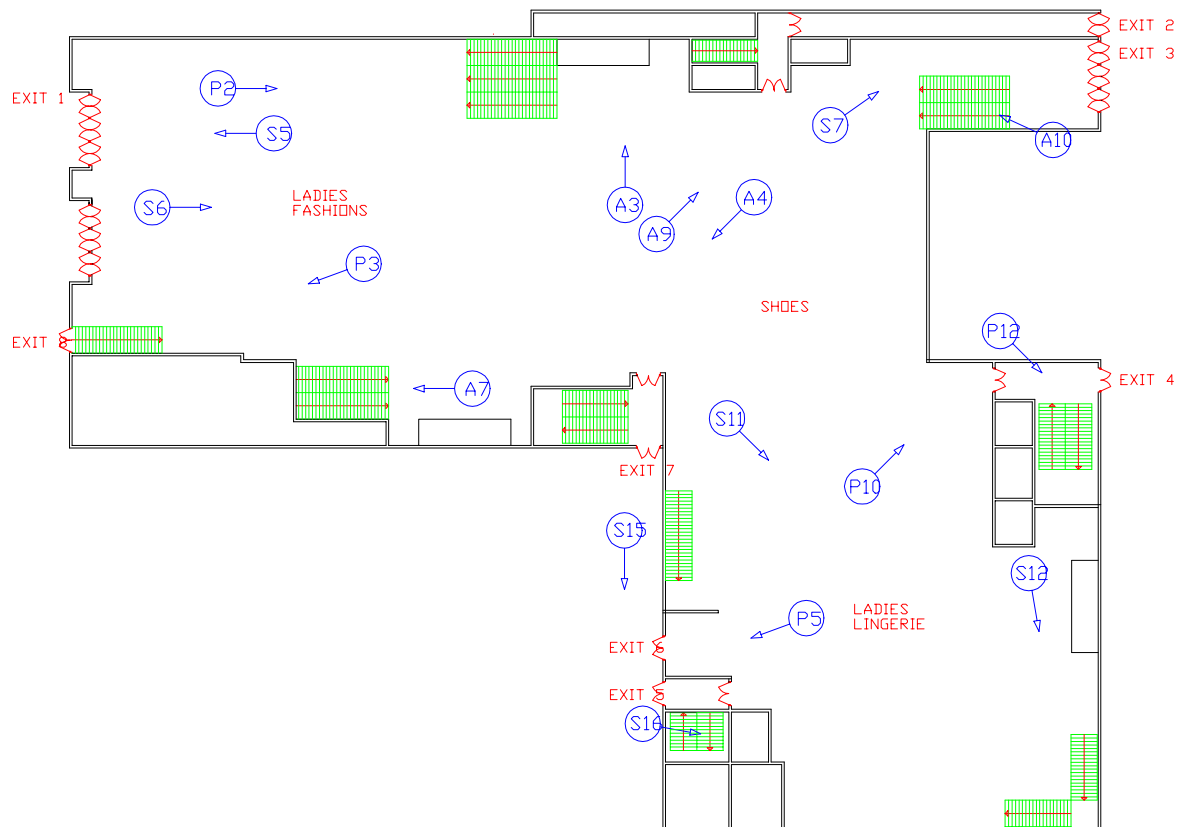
Plan and camera position of the ground floor in Belfast store
